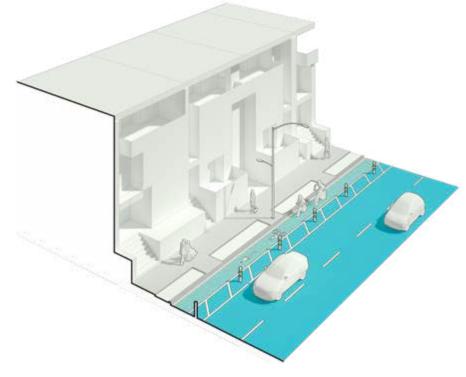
One-Way, In-Street Class IV Bikeway, Adjacent to a Travel Lane, Protected by Bollards.
